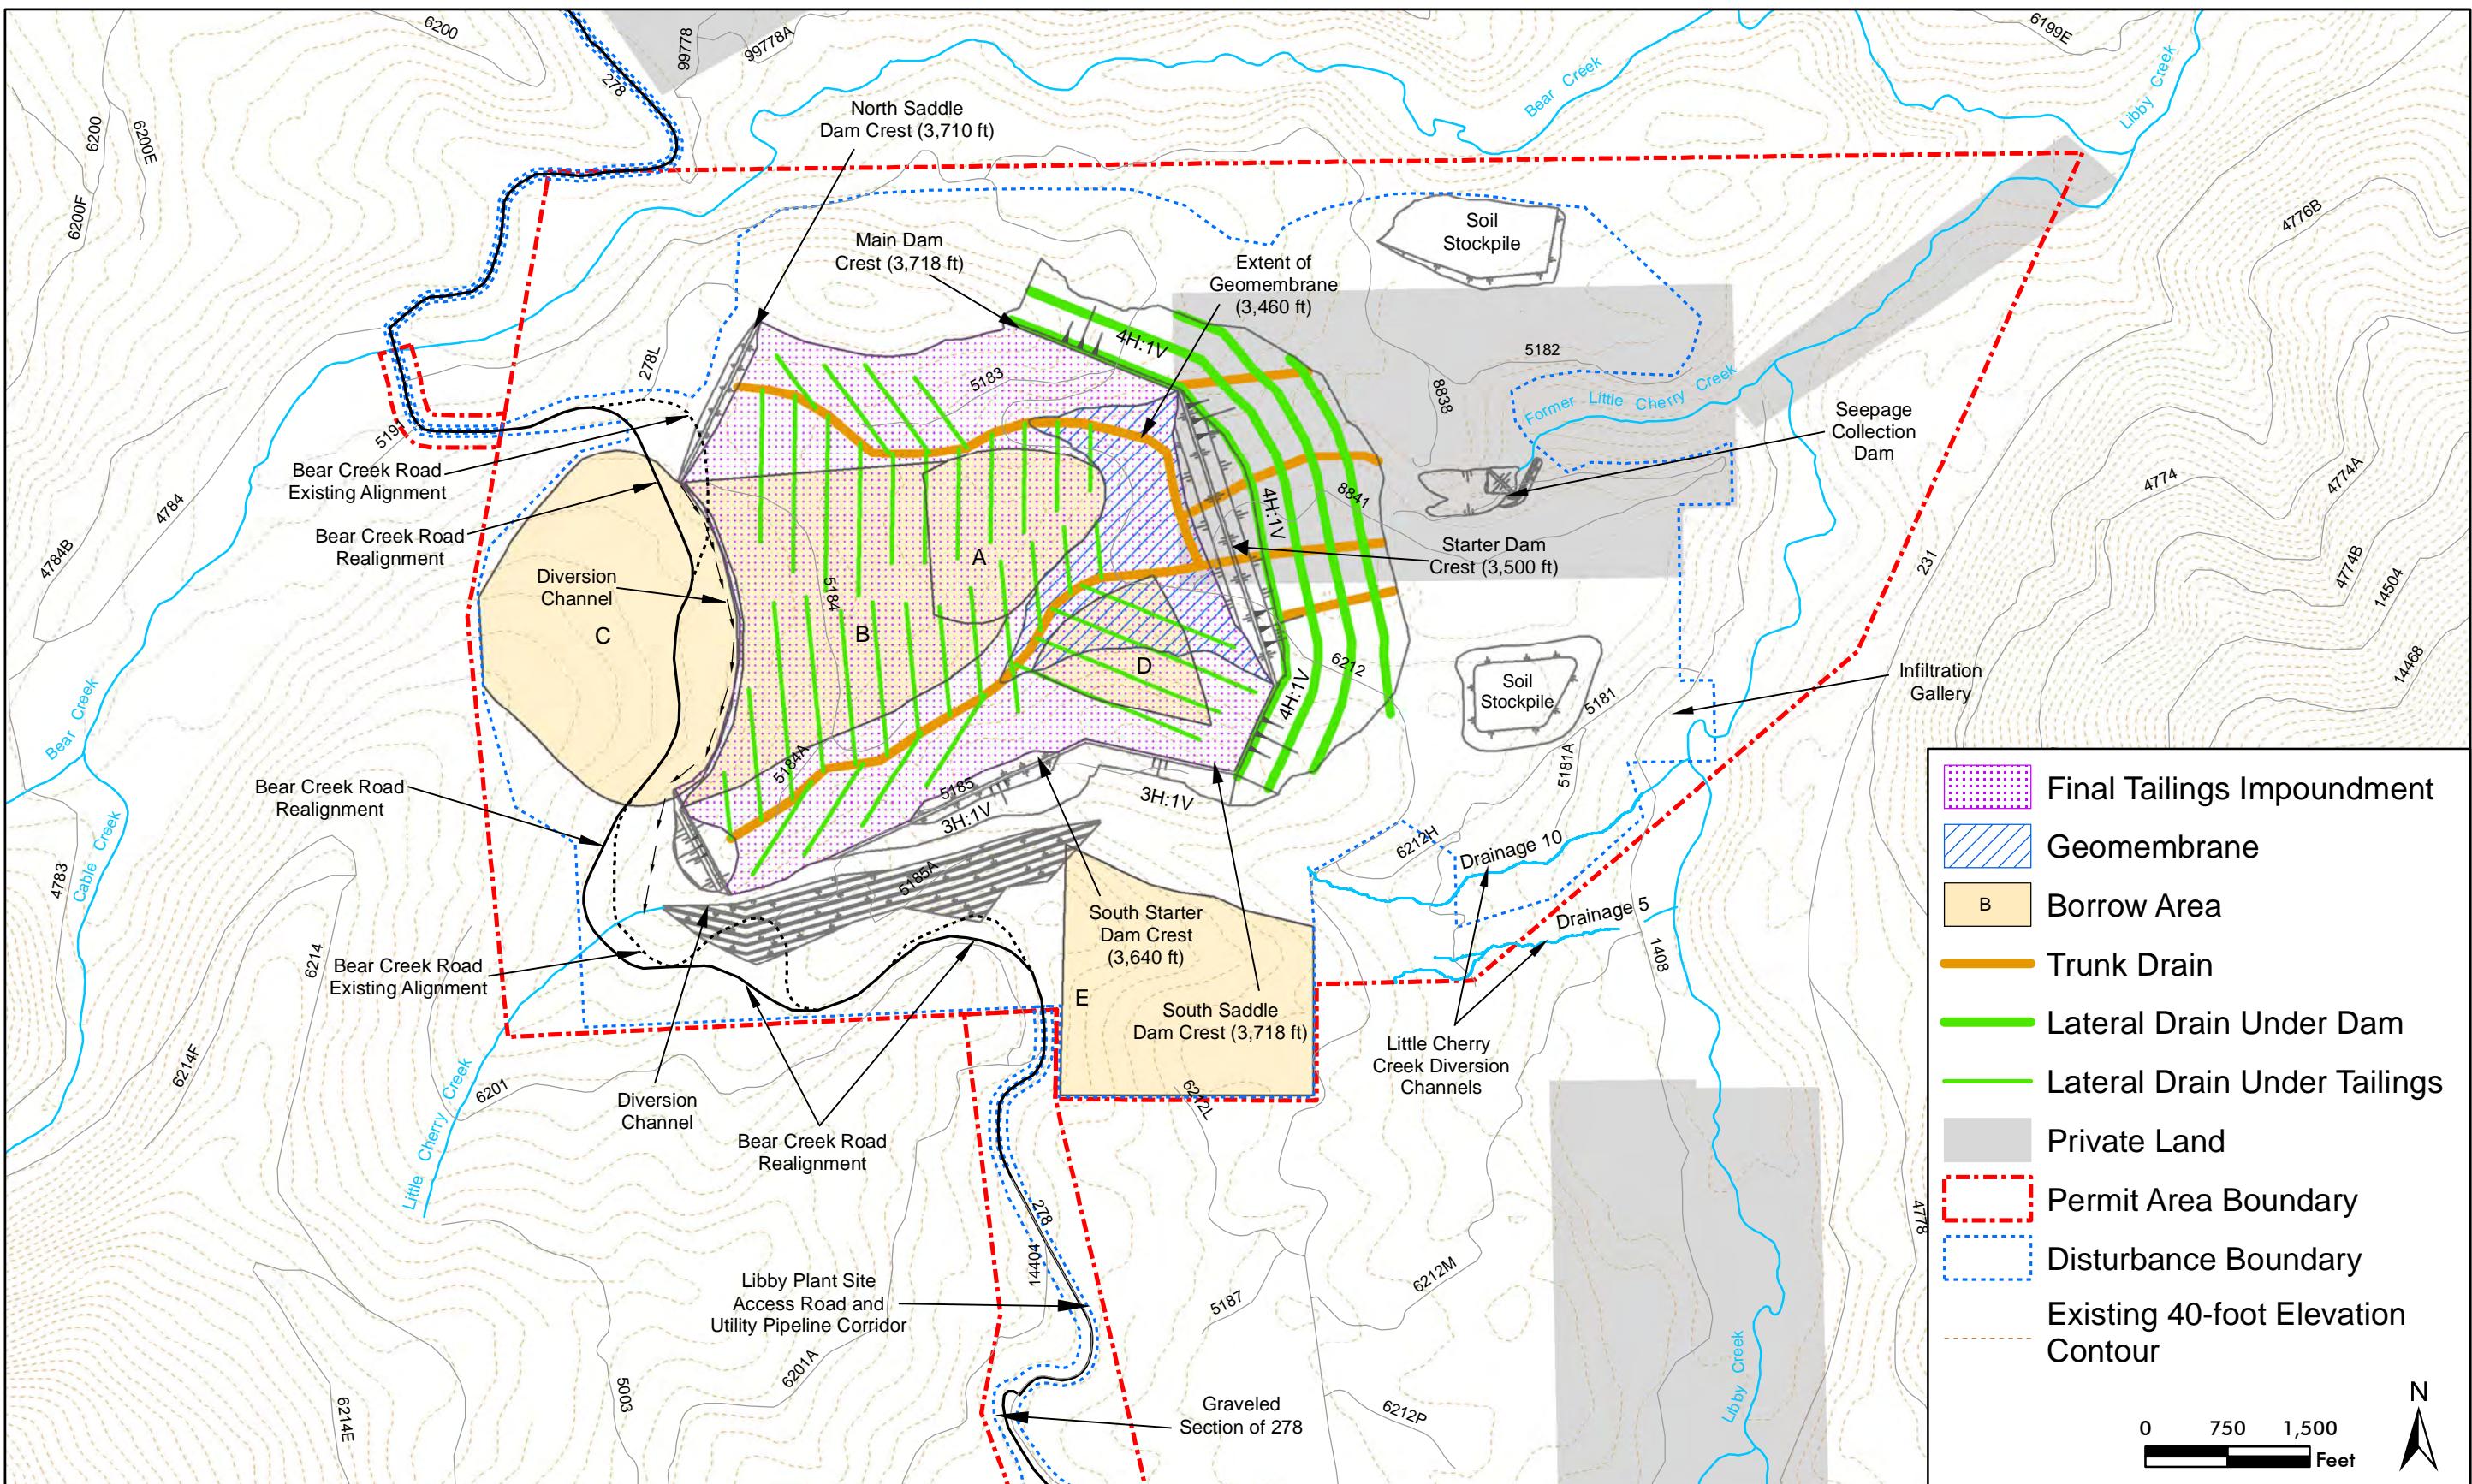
Little Cherry Creek Tailings Impoundment Site, Alternative 4
